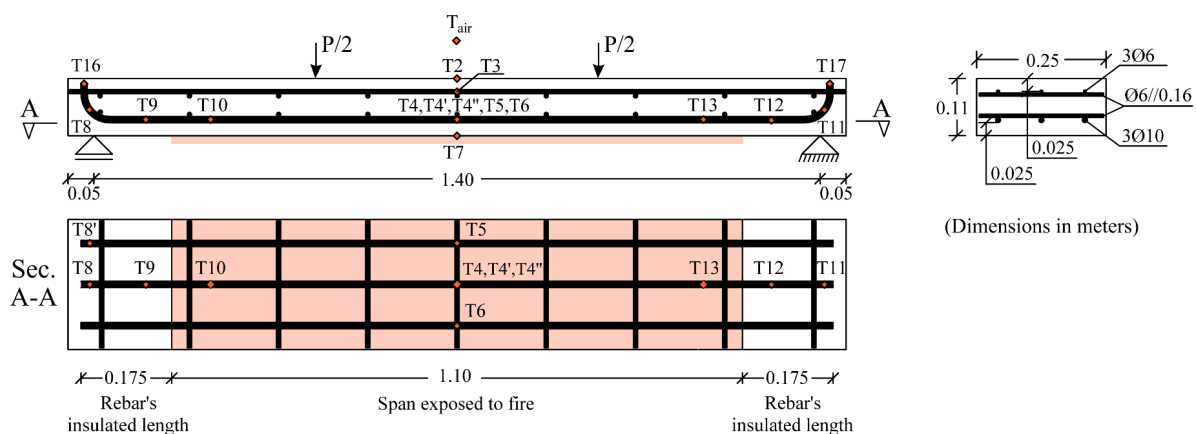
Reinforcement distribution and position of thermocouples of slabs with continuous reinforcement and bent anchorages: slabs SR-C2.5-D10 and RBP-C2.5-D12.
